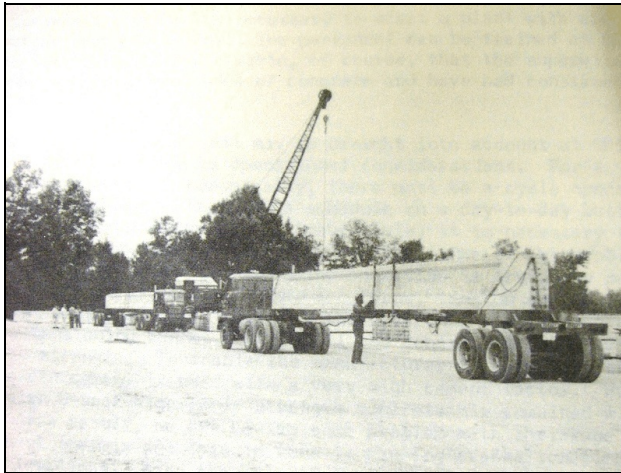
A prestressed-concrete beam is loaded at the College Park fabricating yard for transport to the bridge site on I-85. Source: SHD Biennial Report (1958).
